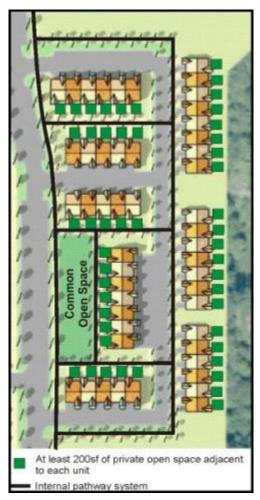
Example townhouse configuration with a combination of private open spaces adjacent to units and larger common open space accessible to all units.
